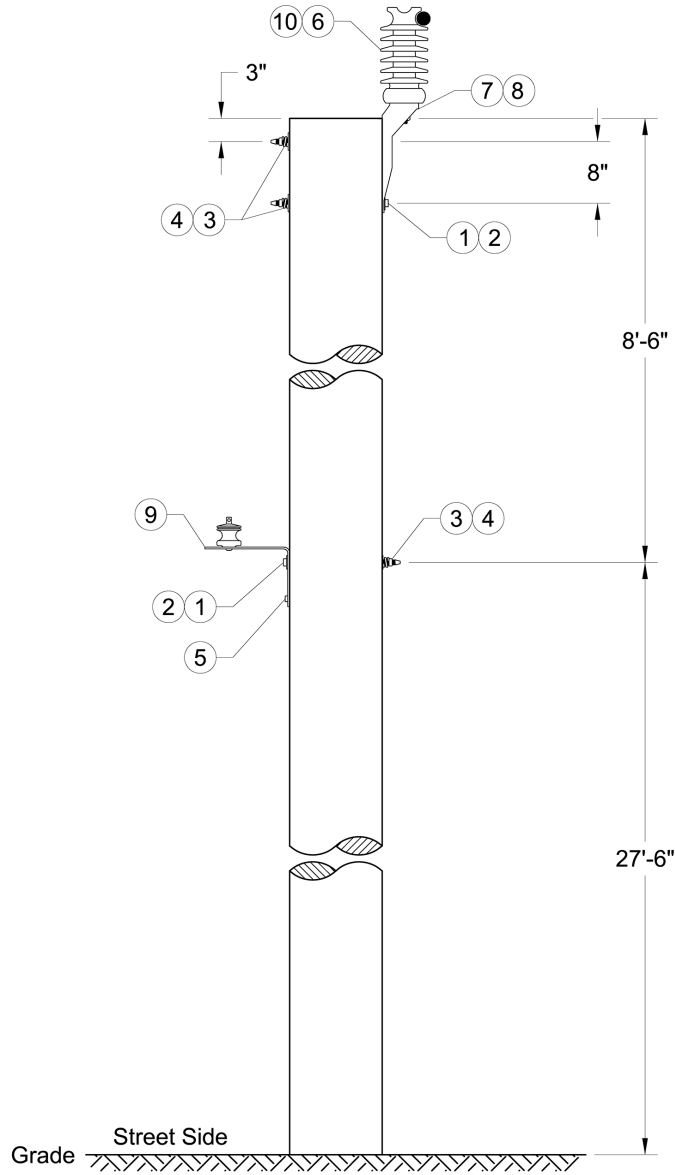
Single-Phase Angle Pole Top Assembly for View Areas
